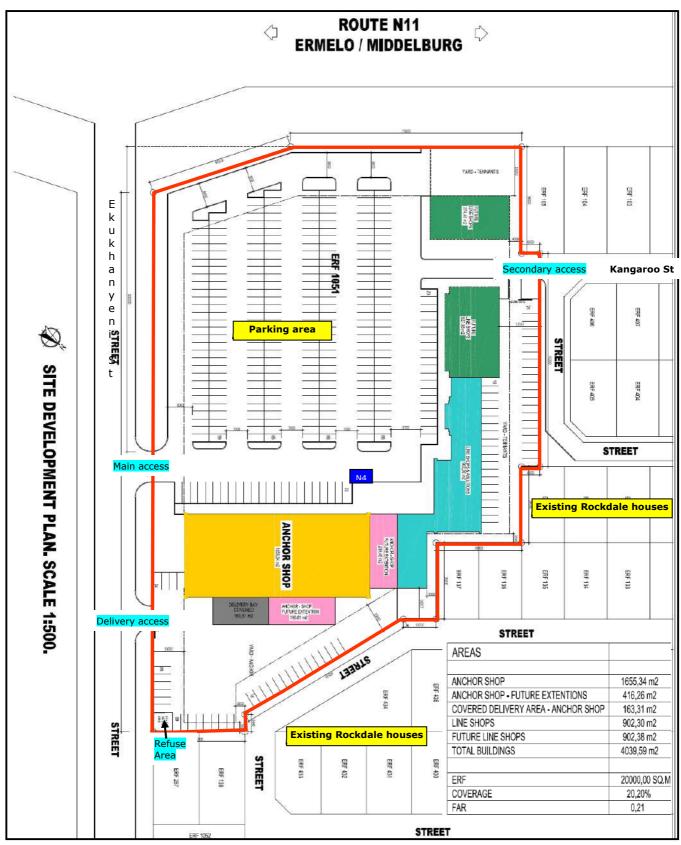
Proposed Site Development Plan (drafted by JSV Architecture, 2019)
